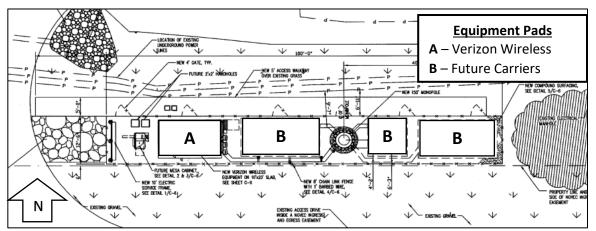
Excerpt of the Special Exception Plan, edited by staff. Source: Applicant.
